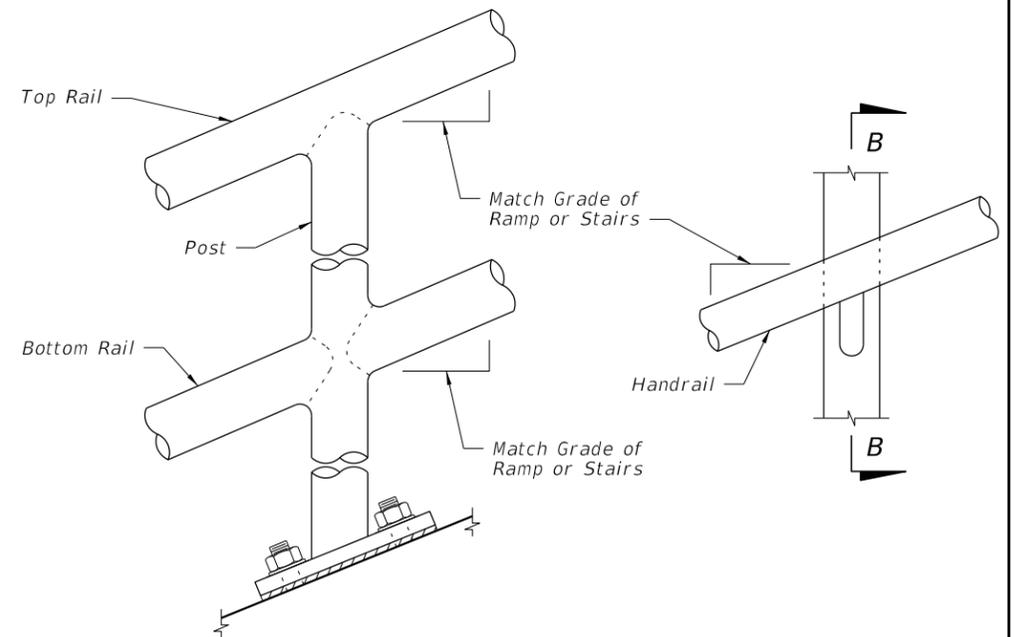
DETAIL "D" - EXPANSION JOINT (FIELD SPLICE SLIP JOINT SIMILAR)
